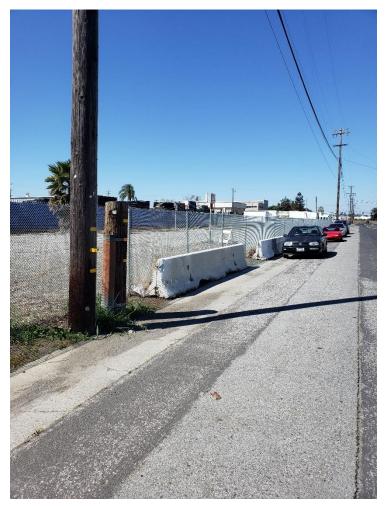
West side of North 28th Street, looking north. Concrete barriers blocking access to the abandoned railroad line can be seen.
